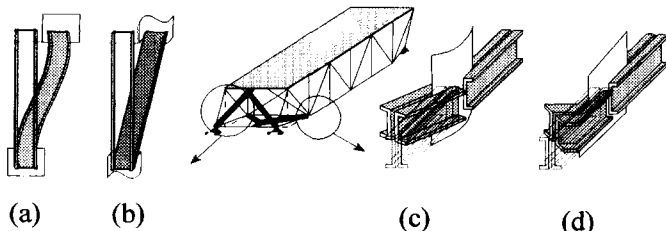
Displacement Limits to Prevent: (a) Excessive Drift of End Verticals; (b) Damage of Vertical Joints due to Excessive Drift; (c) Failure of Lower Chord Joints; (d) Failure of Lower Chord Members
